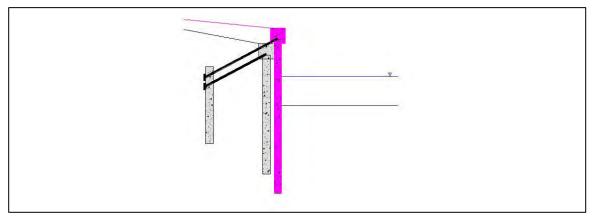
Installation of a new, taller seawall (pink) in front of the existing seawall (grey).
